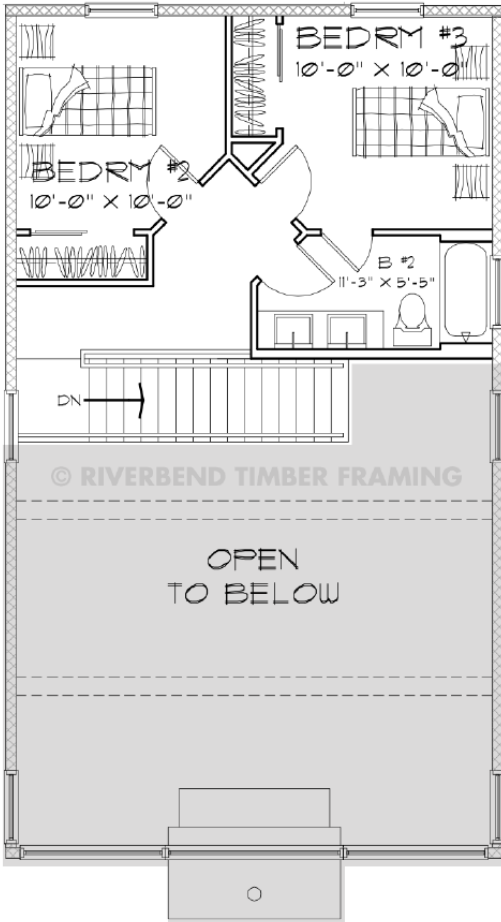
Second Storey Floorplan for Dwelling on Severed Lot (Source: Brauer Homes)
